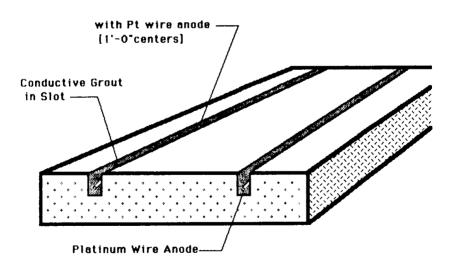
Bridge deck protected by platinum wires grouted into slots in deck
